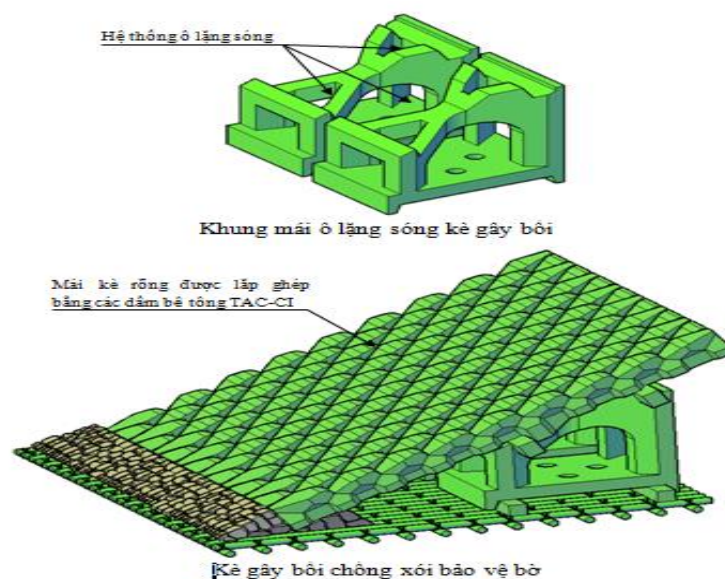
Precast concrete element considered for groyne elements in Ca Mau (Source: Province of Ca Mau)
